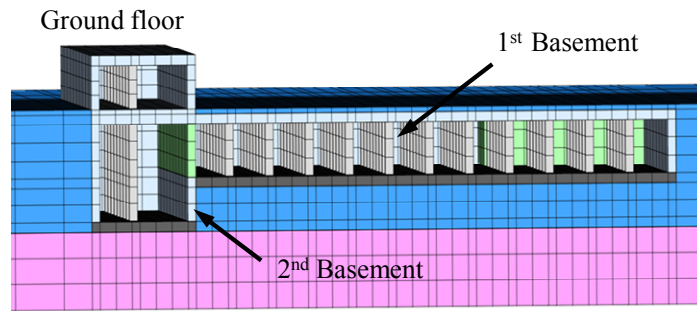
Modeling profile inside the underground purification reservoir (Longitudinal section)
